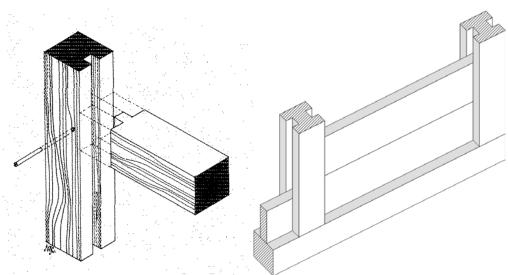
Diagrams showing the wall construction techniques of poteaux-en-coulisse [left] and madriers-encoulisse [right].<sup>2,99</sup>
